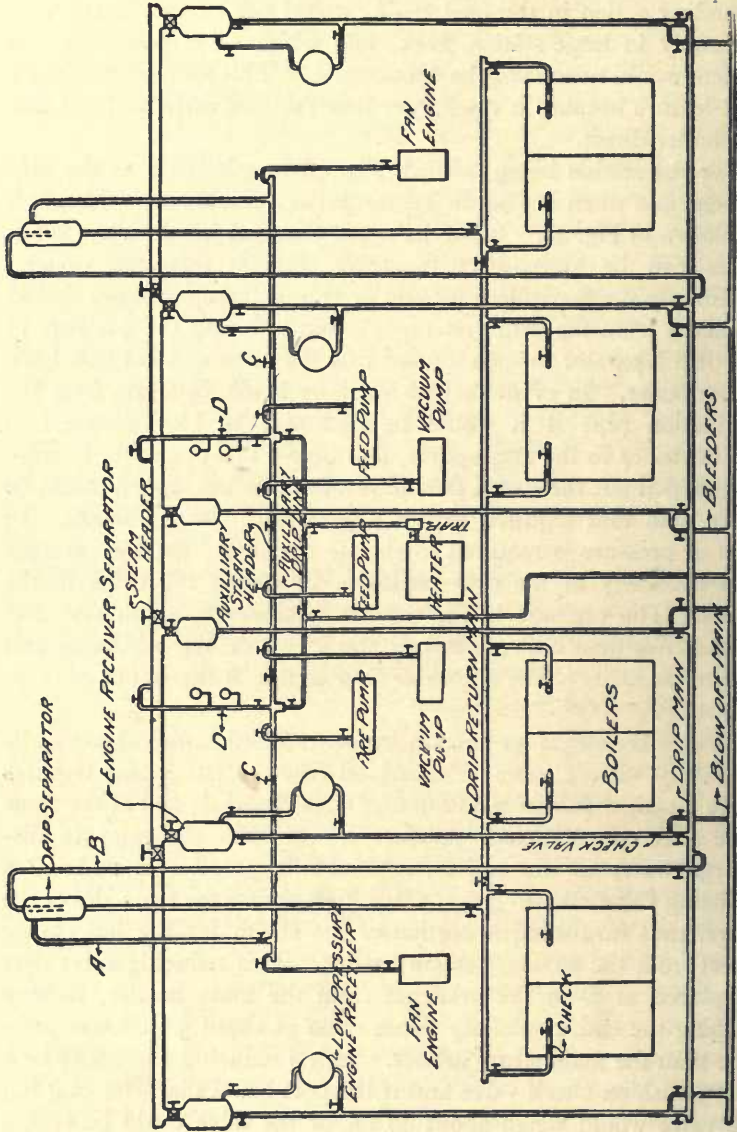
System; Steam, Boiler Feed, and Gravity Drip Return.
